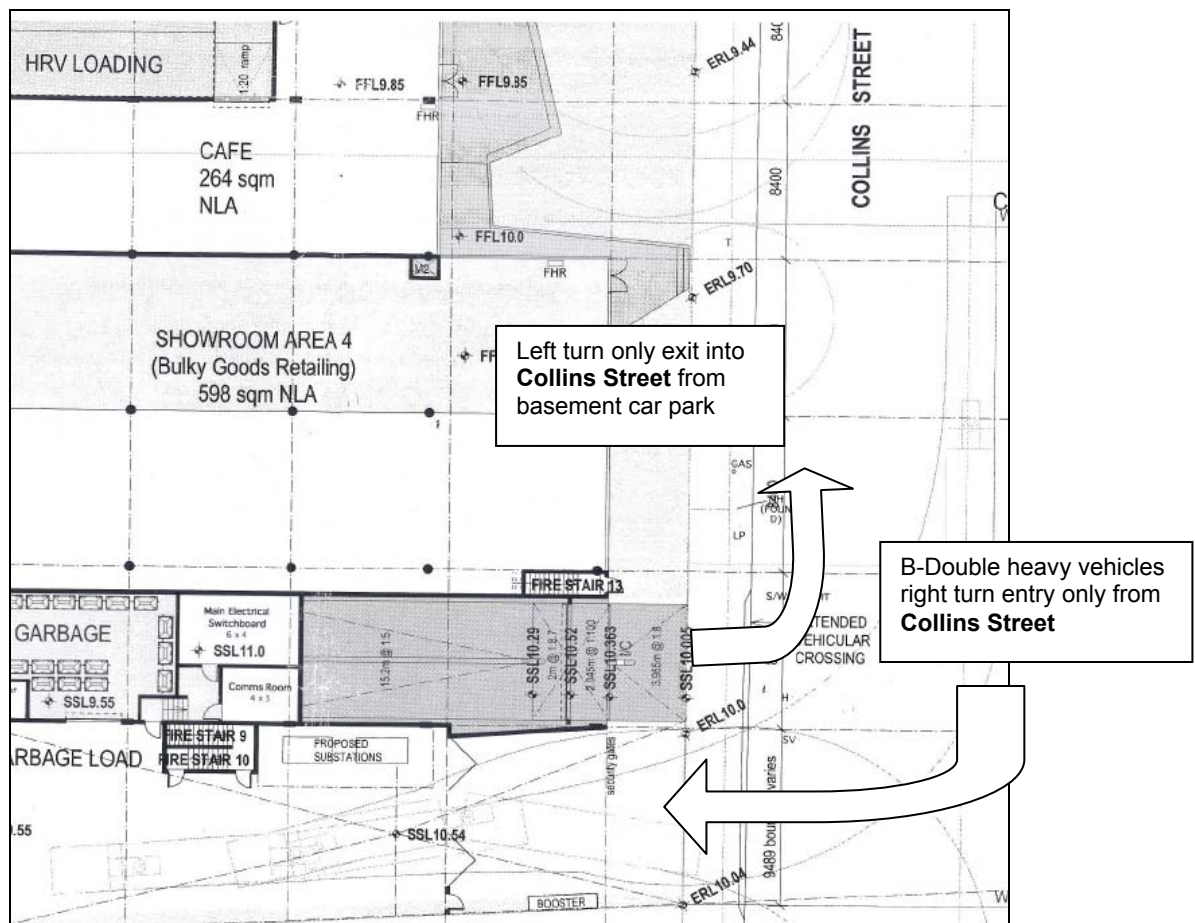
Driveways at eastern corner of Collins Street showing proposed vehicular entry/exit arrangement.
